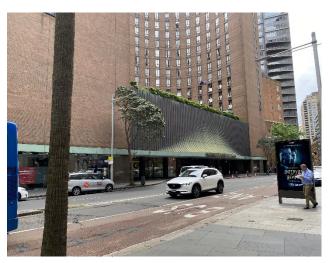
Sydney Metro construction site opposite the site on Bligh Street
